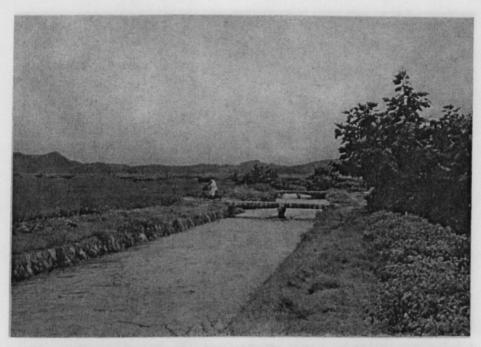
Main canal downstream from Mitsumizo, with figs and peppers growing on right bank. Note rock retaining walls.
